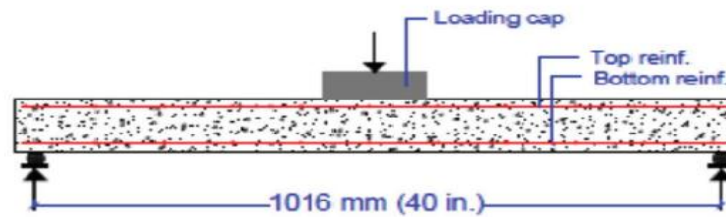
Slab geometry and loading points (source: Aljazaeri et al., 2020)
